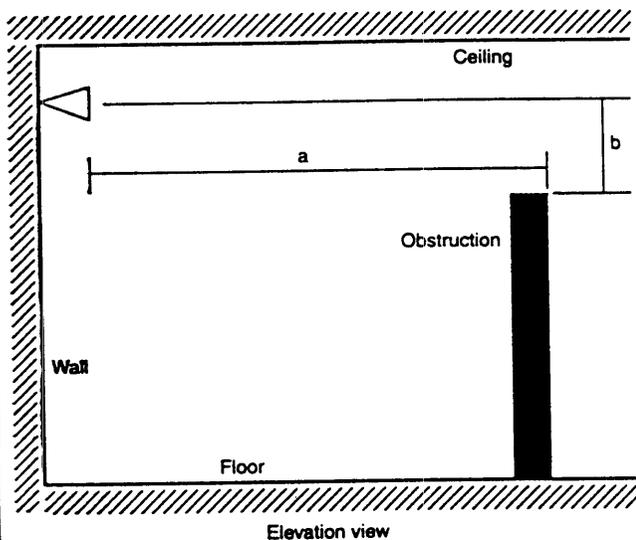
Suspended or floor-mounted obstructions (standard sidewall spray sprinklers).
